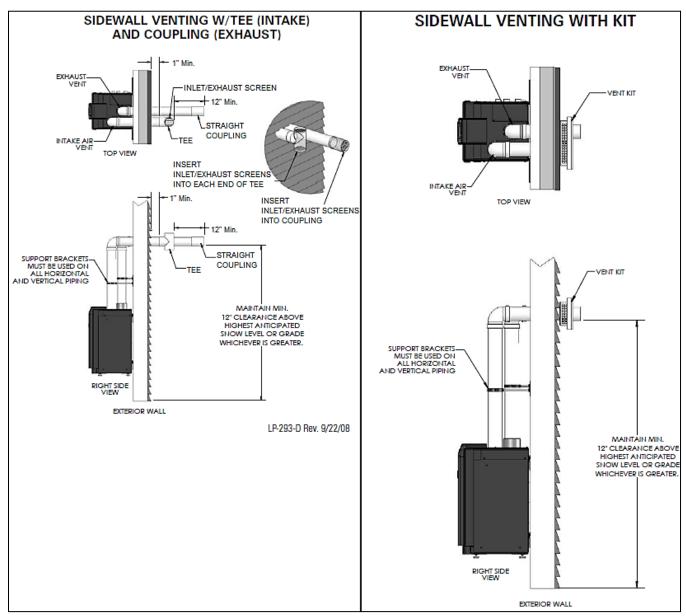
Sidewall Venting with Tee (Intake) and Coupling (Exhaust) - LP-293-E
